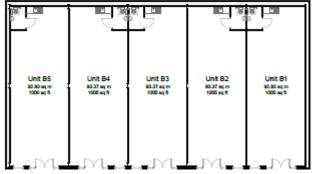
Typical Proposed Floor plans (Unit B shown)
